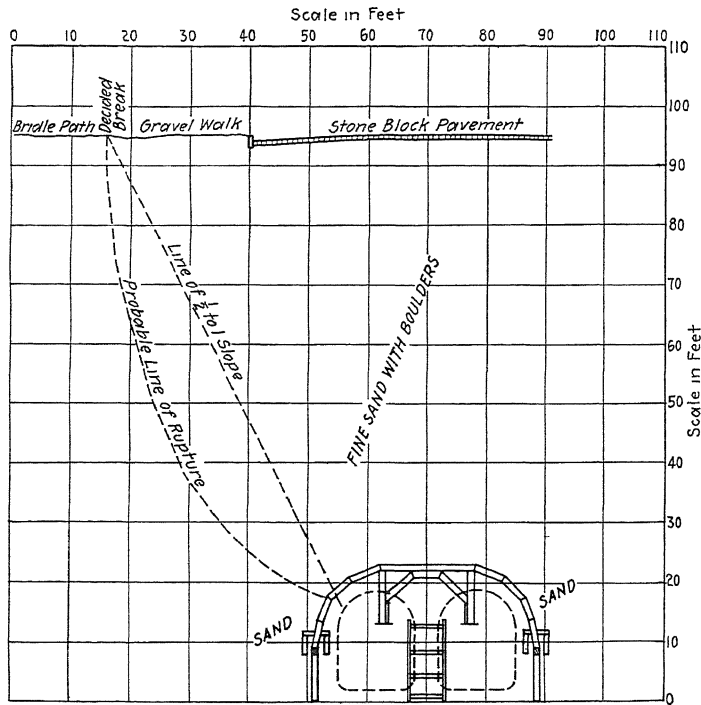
TRANSVERSE SECTION OF TIMBERED SUBWAY TUNNEL.
